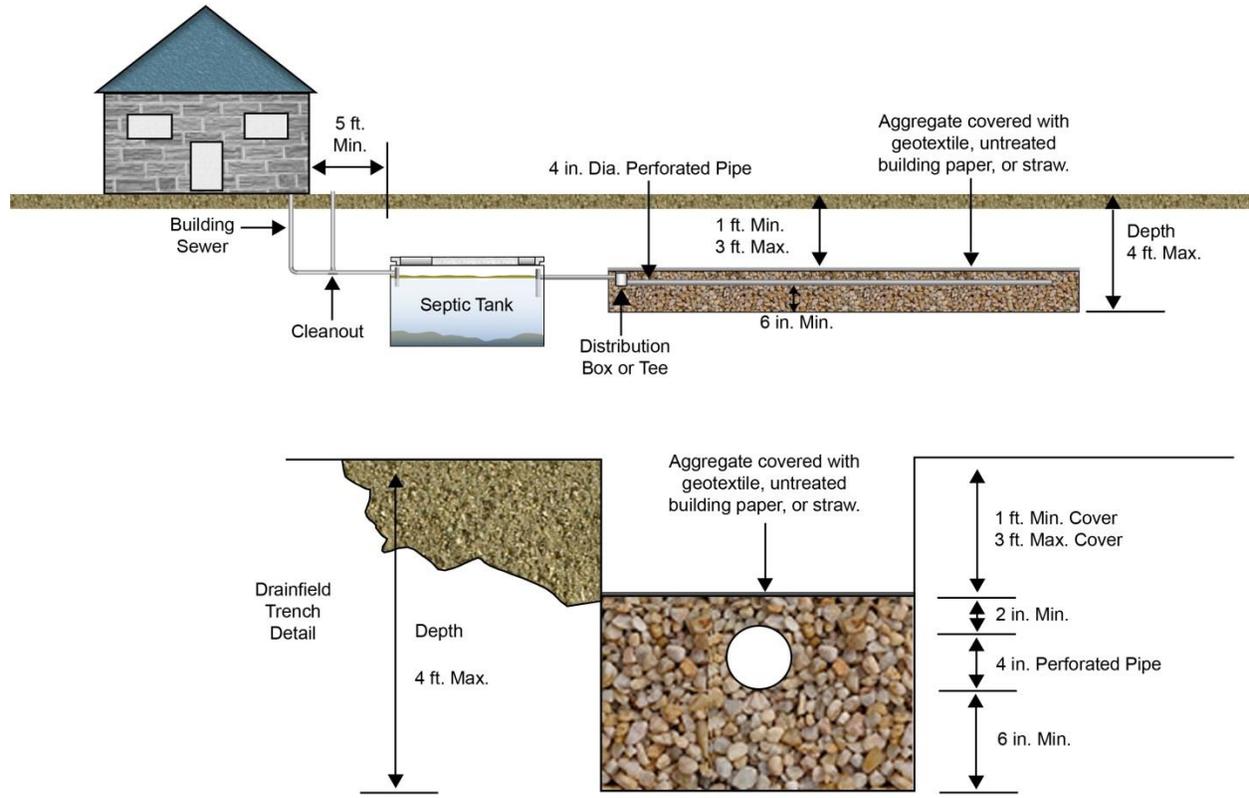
Cross-sectional view of a standard drainfield and trench dimensional installation requirements.
